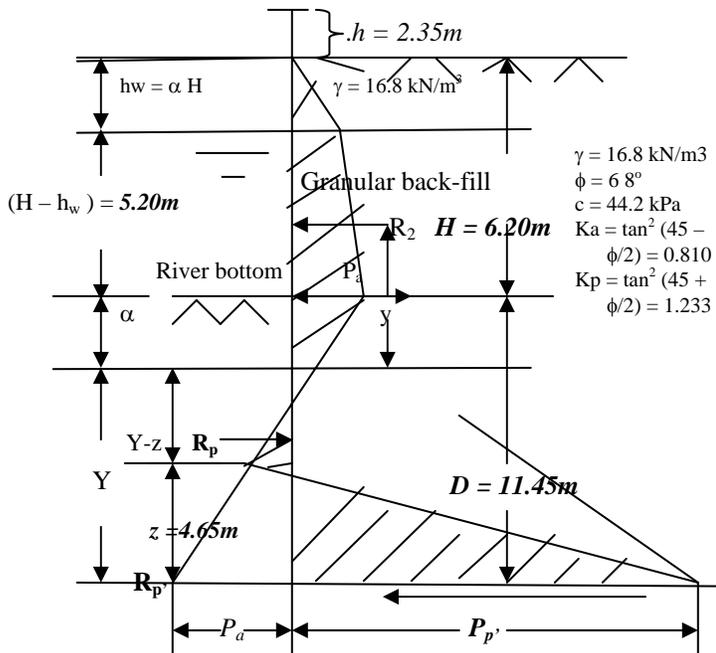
Likely Pressures on Sheet-Piling at the project site
